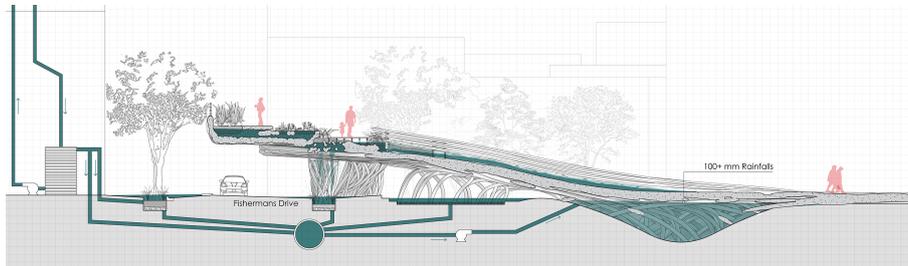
Section: Proposed structure mediate flooding issue on the test site.
